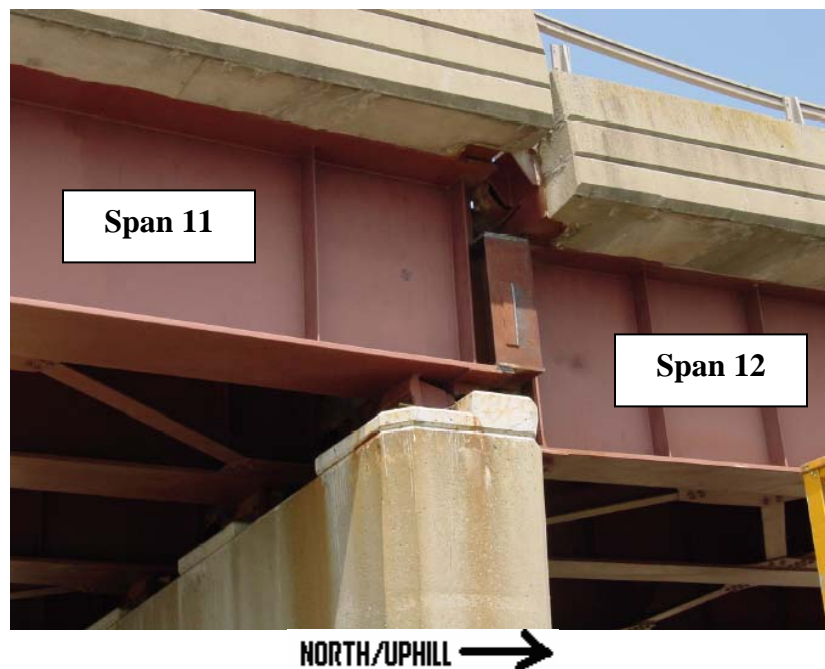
Photograph showing the fallen rocker bearings and girders after the collapse.
